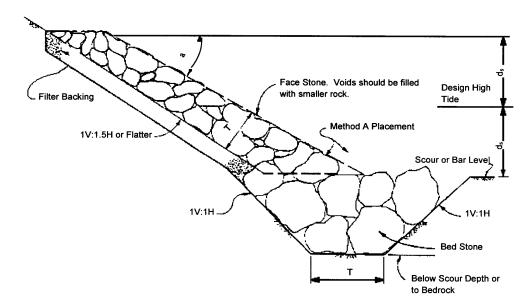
Riprap Rock Shore Protection Typical Design Configuration
